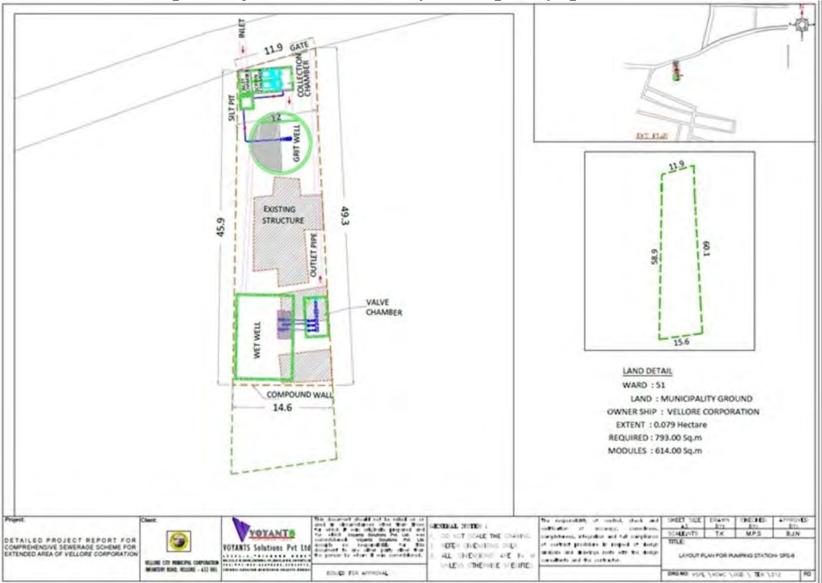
Layout Plan on Revenue Map for Sewage Pumping Stations – 8
